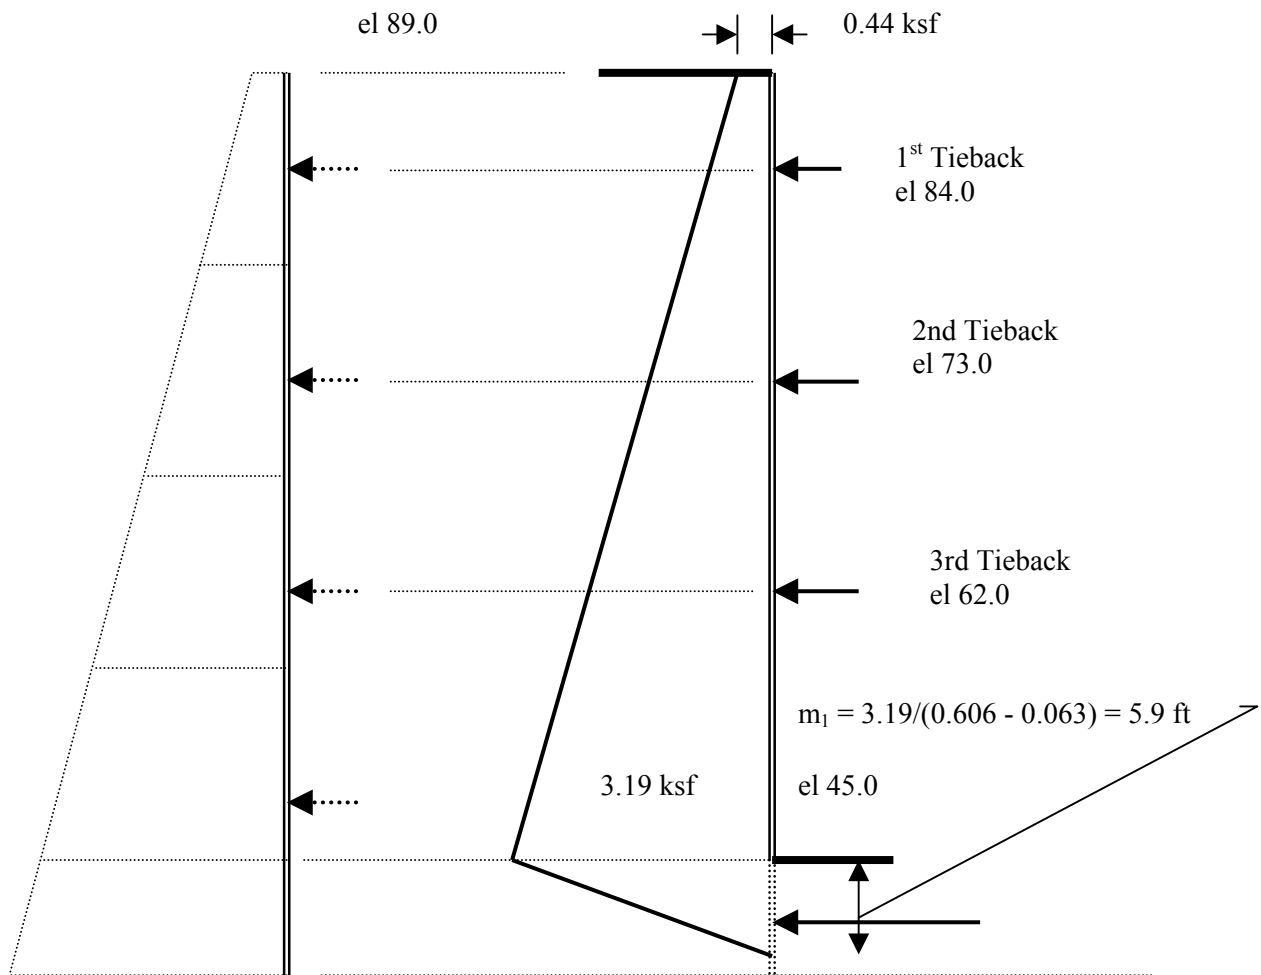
Step 10, excavate to el 45.0, fourth-stage excavation
